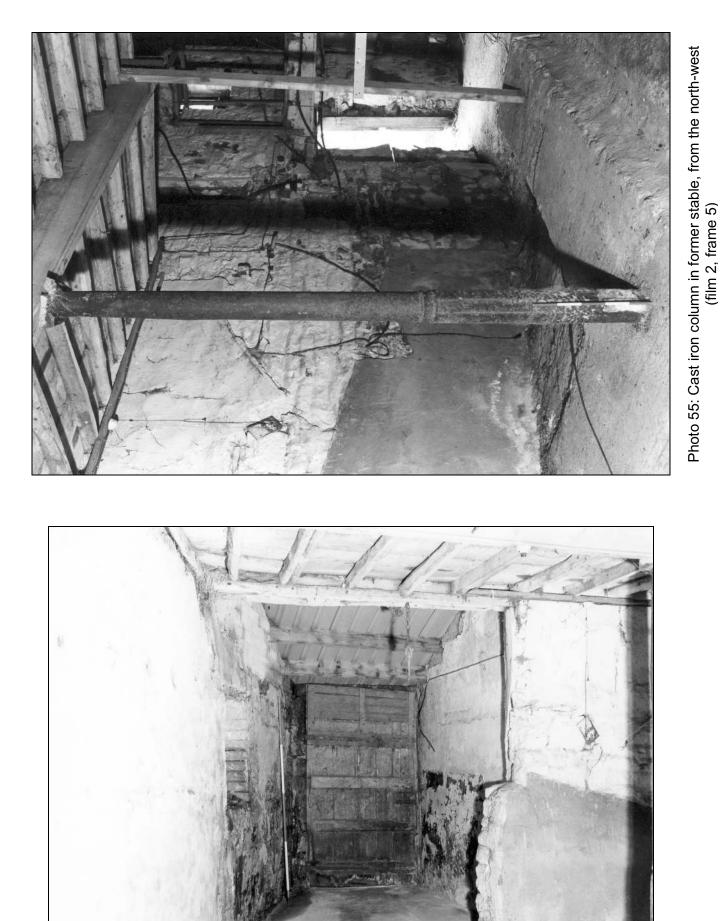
View into former stables' entrance porch, from the west (film 1, frame 8)
